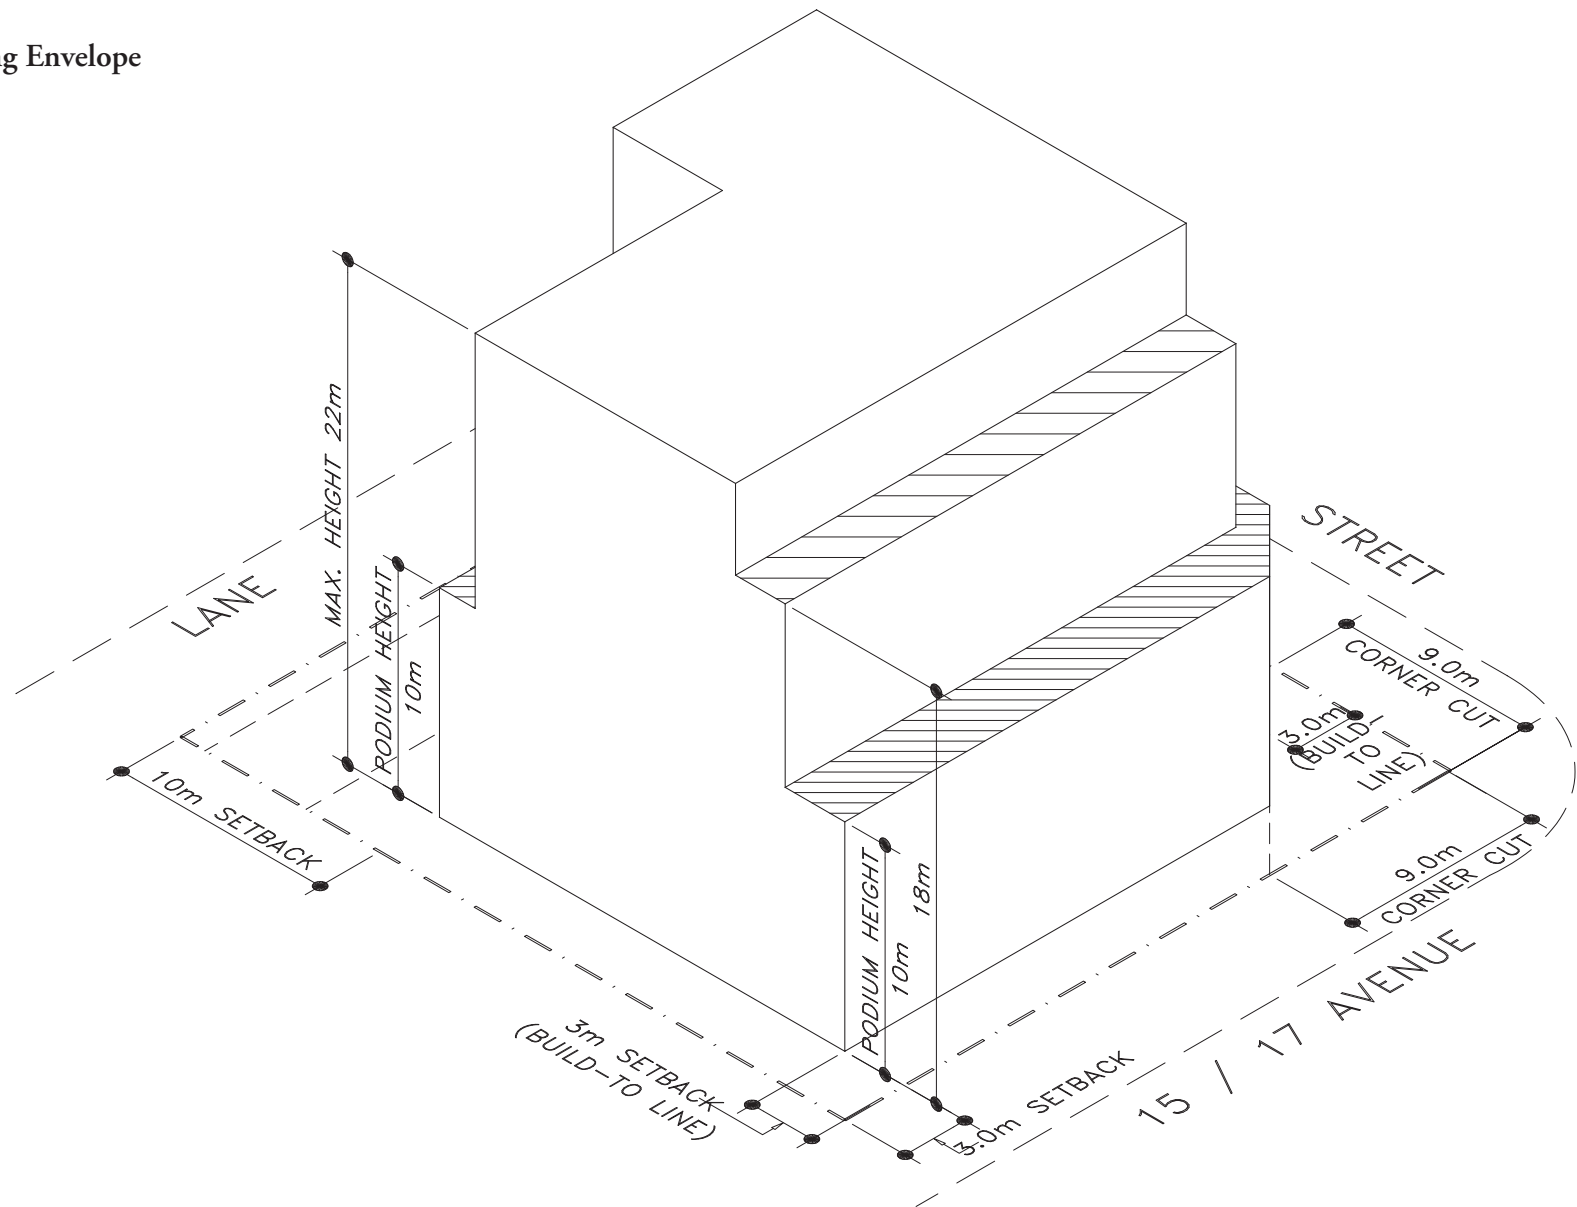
Building Form Example – Multi-residential Support Commercial Use Areas at Corner
